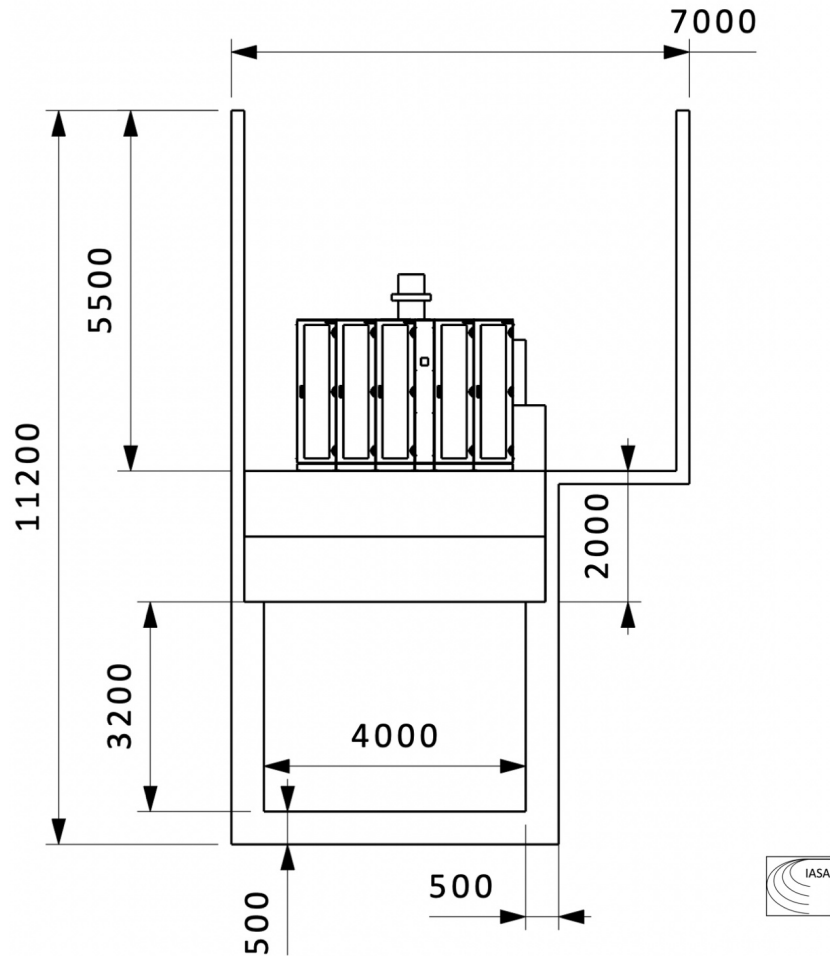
Cross-section drawing of the Linac Tunnel and Infrastructure Hall.
